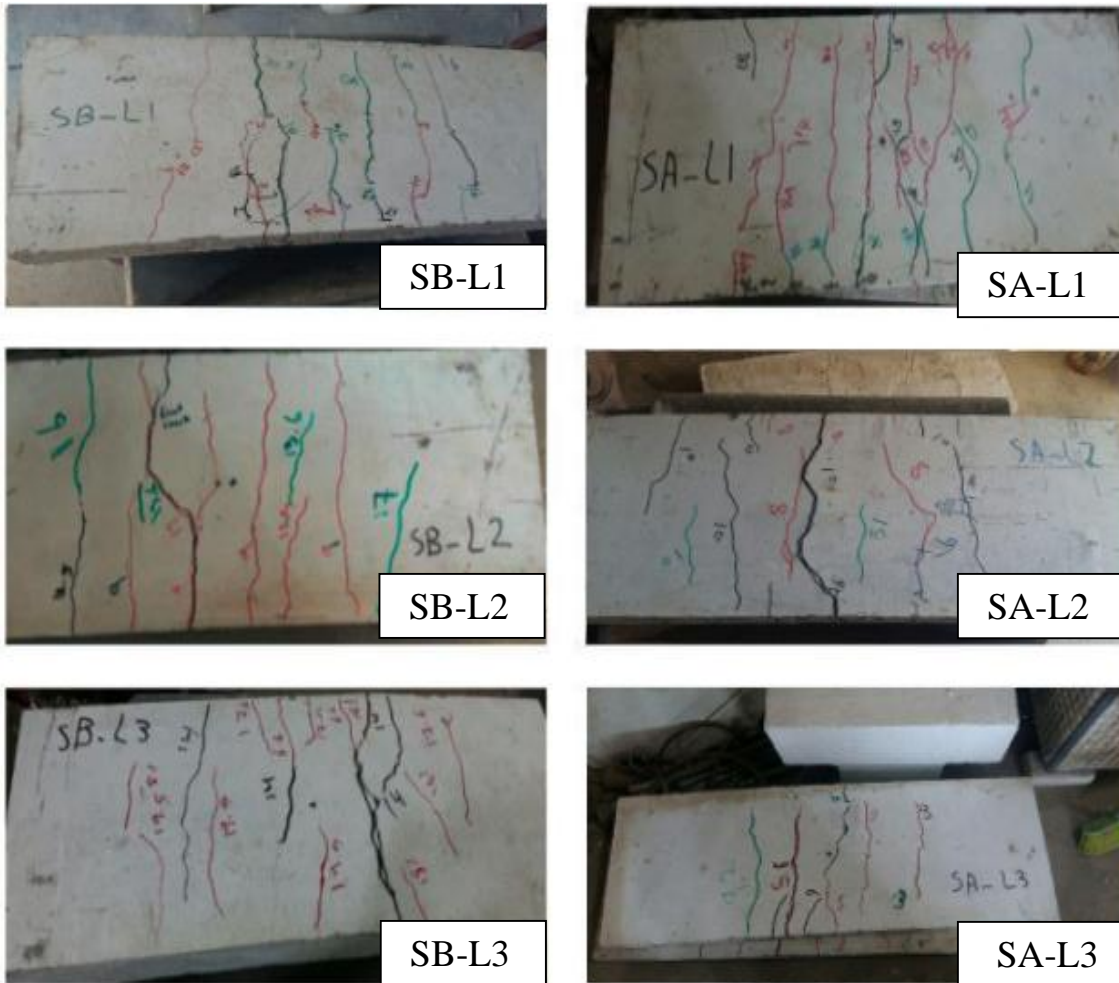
Cracks Patterns for Sandwich Slab with Discrete Shear Connectors at Lower Face of Bottom Layer
